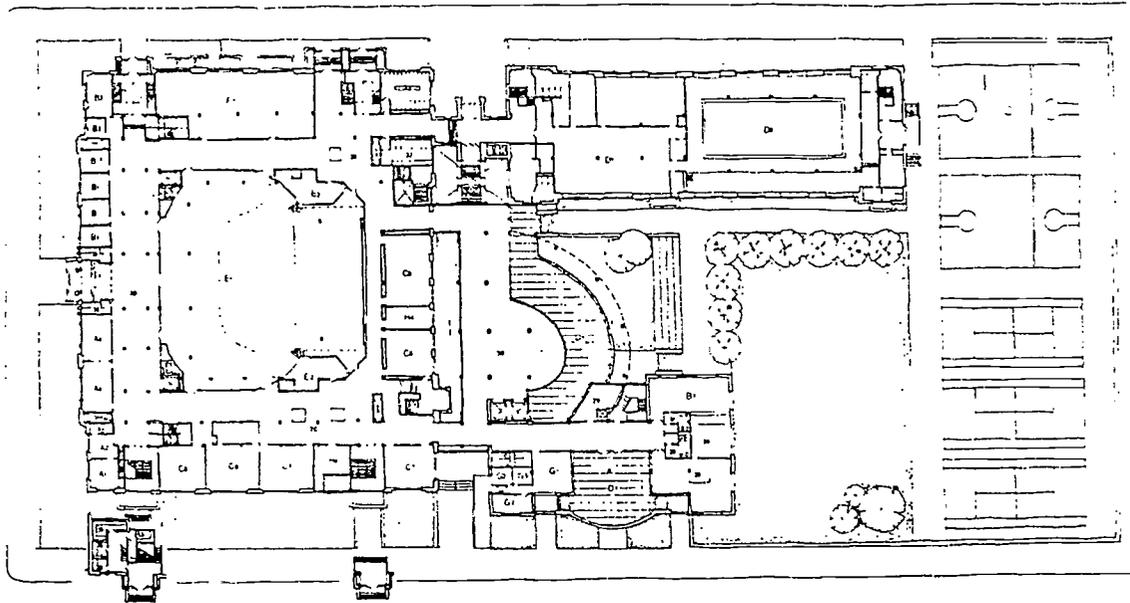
Ou Boyes Jong, project for Prospect Heights, first floor plan
